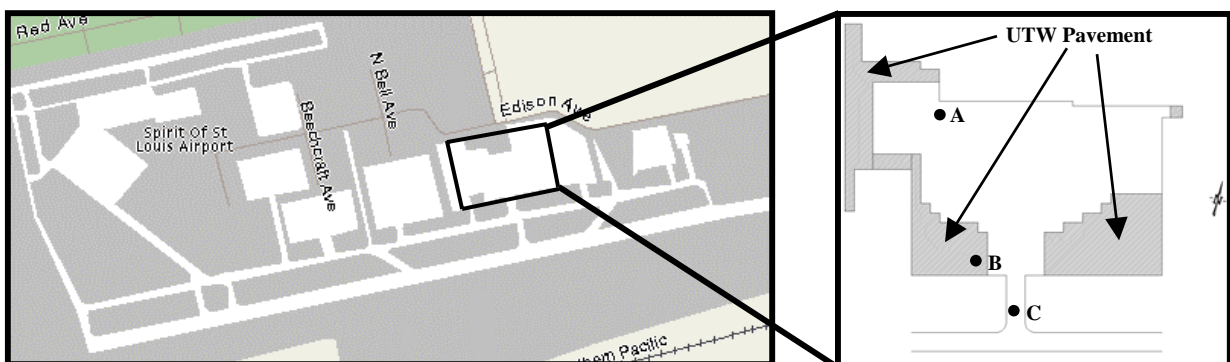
Layout of airfield pavements at the Spirit of St. Louis Airport.
